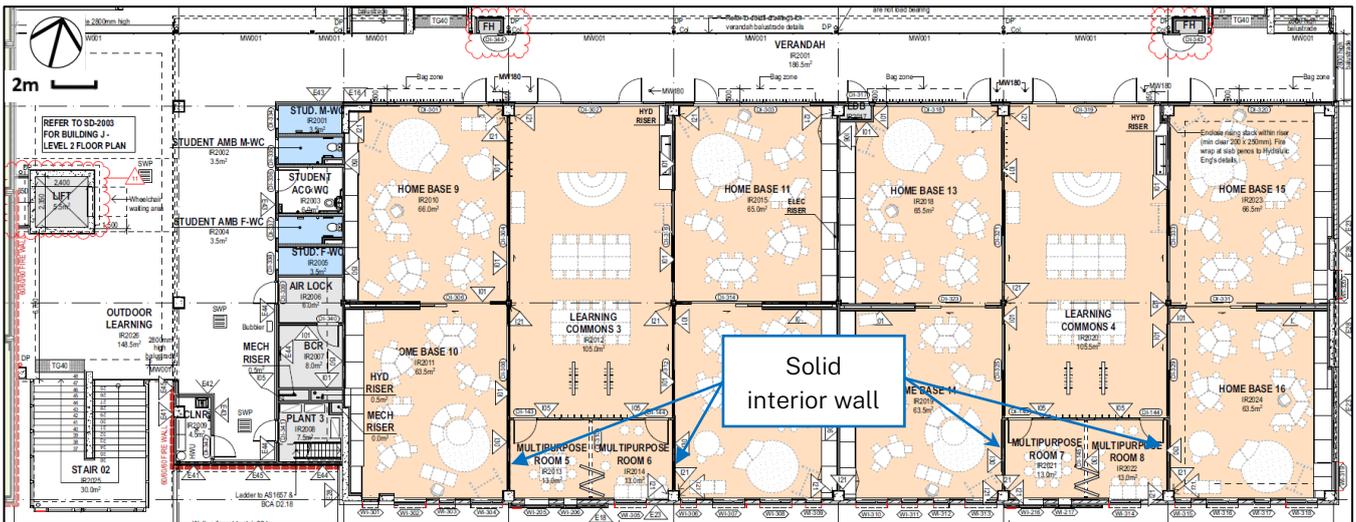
| Approved level 3 floor plan of Building I (Base source: Modification 2, 2023)
